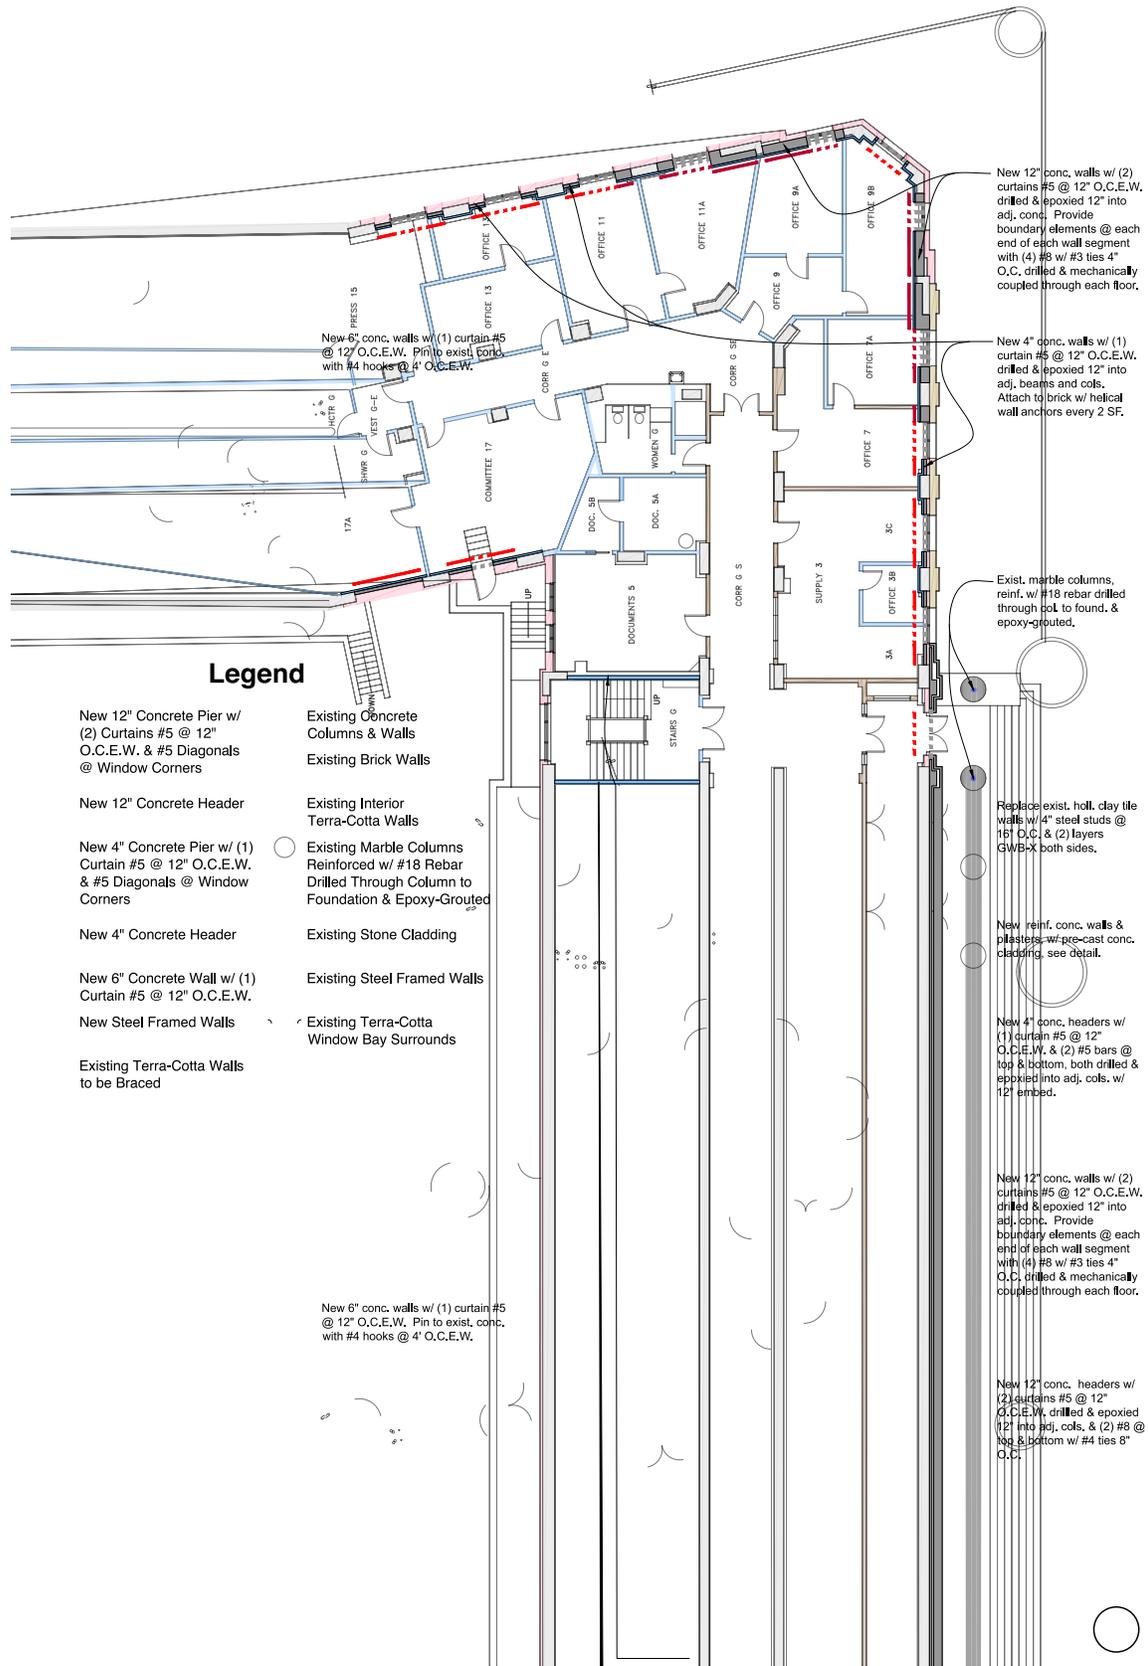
(3): Structural Reinforcing of Building Frame - Ground Floor Level
